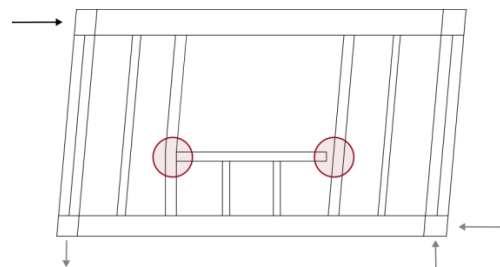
Schematic deformation of a horizontally loaded timber-framed shear wall element with a window opening. The two critical points at the window corners are marked with red circles.
